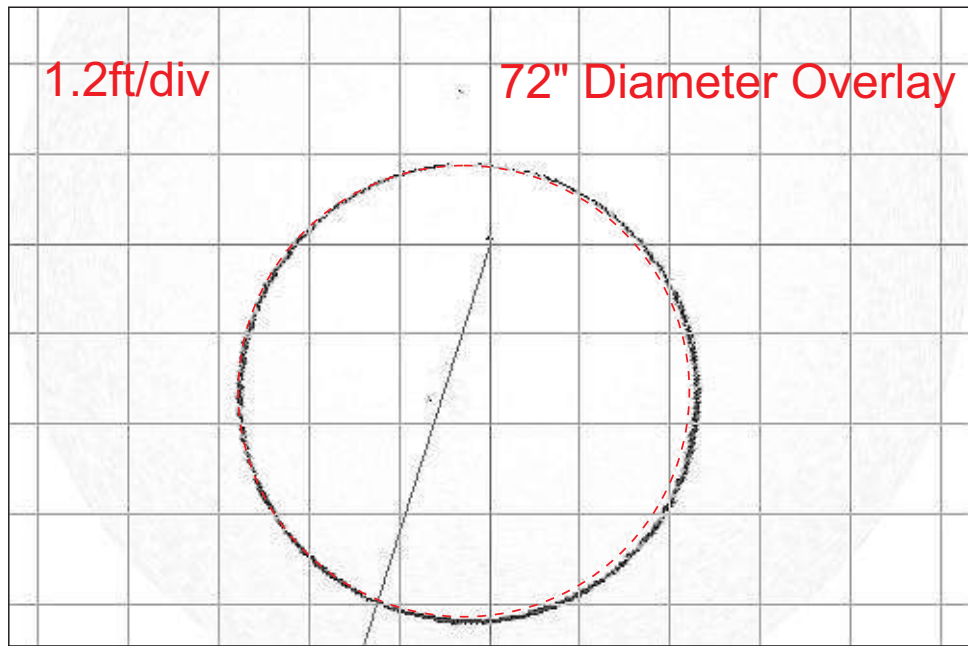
Sonar Profile 14 - 136 feet downstream of Access Point 1.
